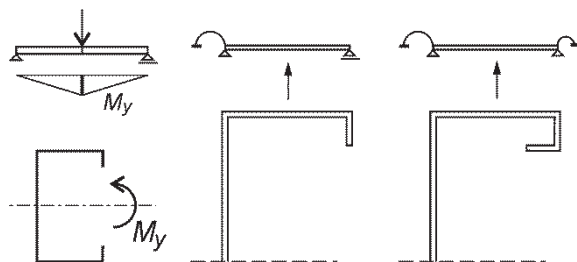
Static scheme of a cold-formed thin-walled section's compressed plate (flange)
